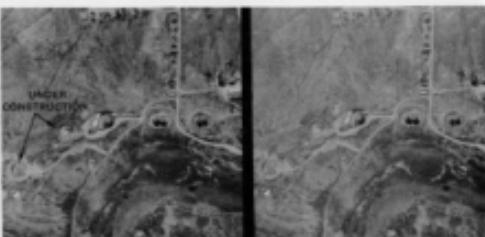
Aboveground fuel tanks adjacent to airfield. Tank foundations and firebreaks under construction. Alaska.
